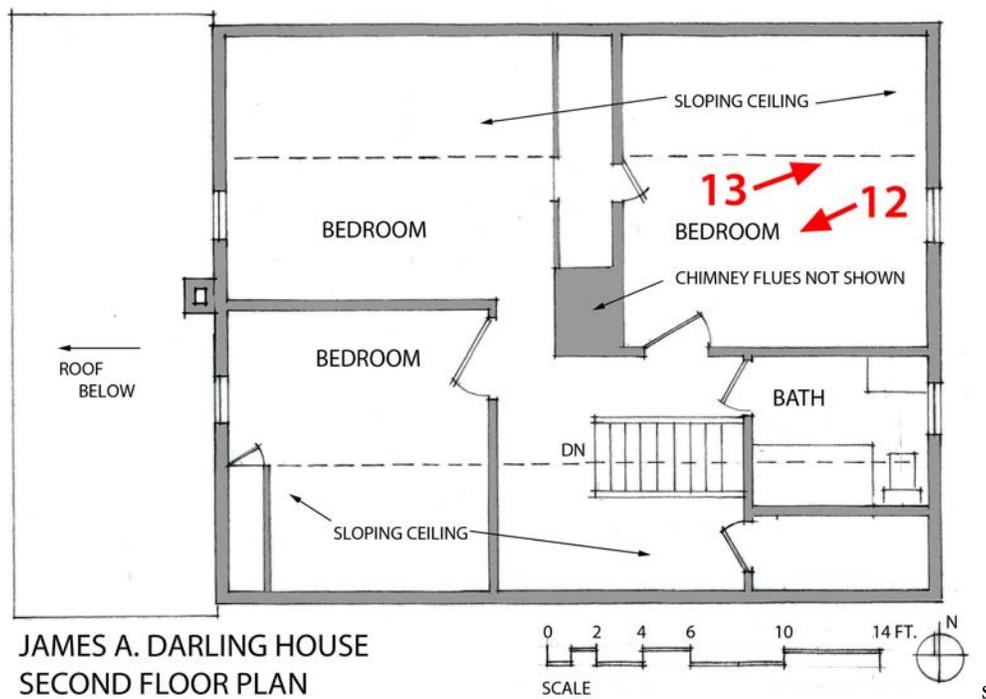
Second floor plan, James Alexis Darling House, 1932 Litchfield Turnpike, Woodbridge, CT with photograph key.
